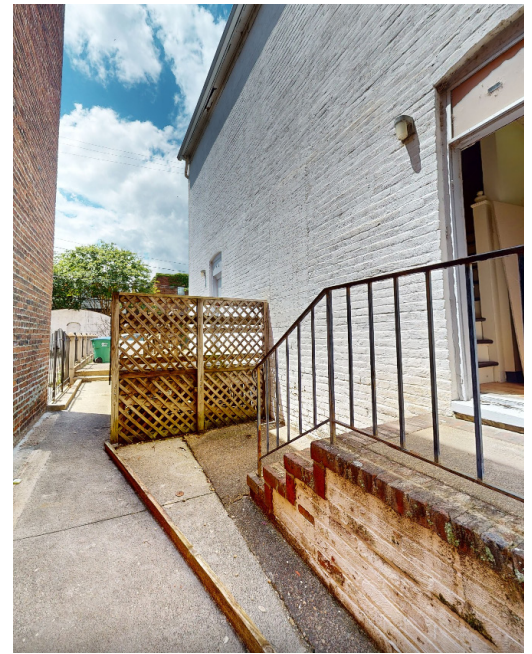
Plan south elevation seen from between 1109 and 1107 W Franklin St
